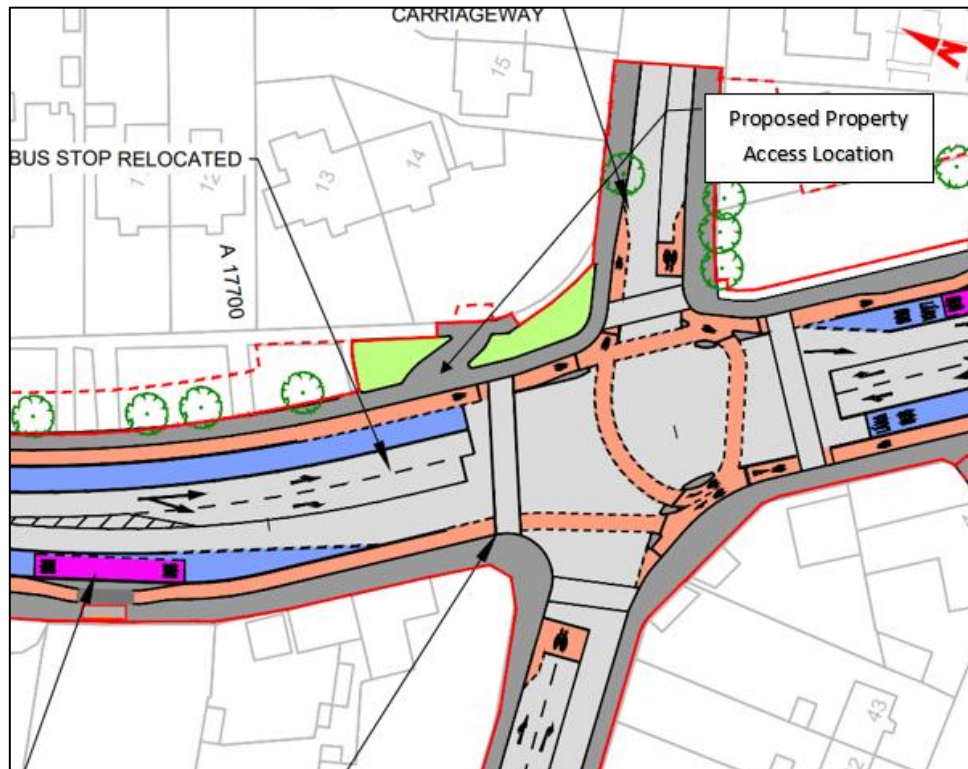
Extract from General Arrangement Drawings showing Access to 14 Dublin Road (Sheet 50)
